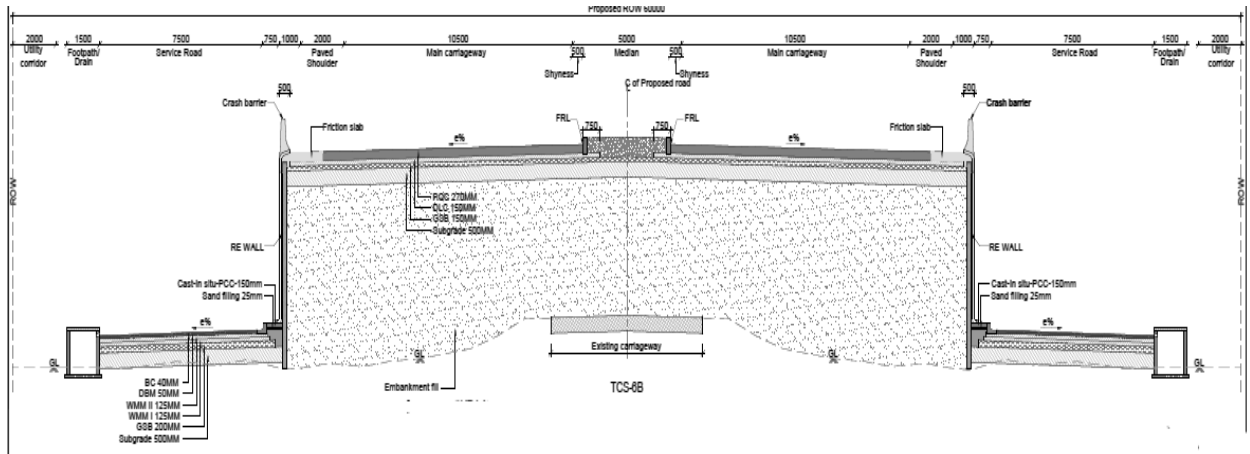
TCS-6B Typical Four Lane Underpass Cross Section with Service Roads in The Existing Road
